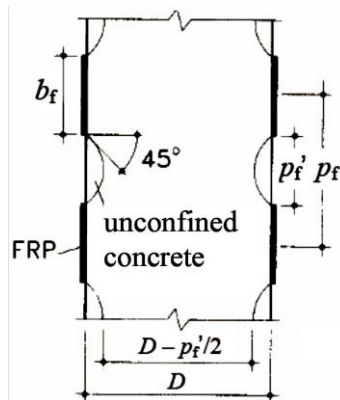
Elevation view of circular member confined with FRP strips (CNR)
